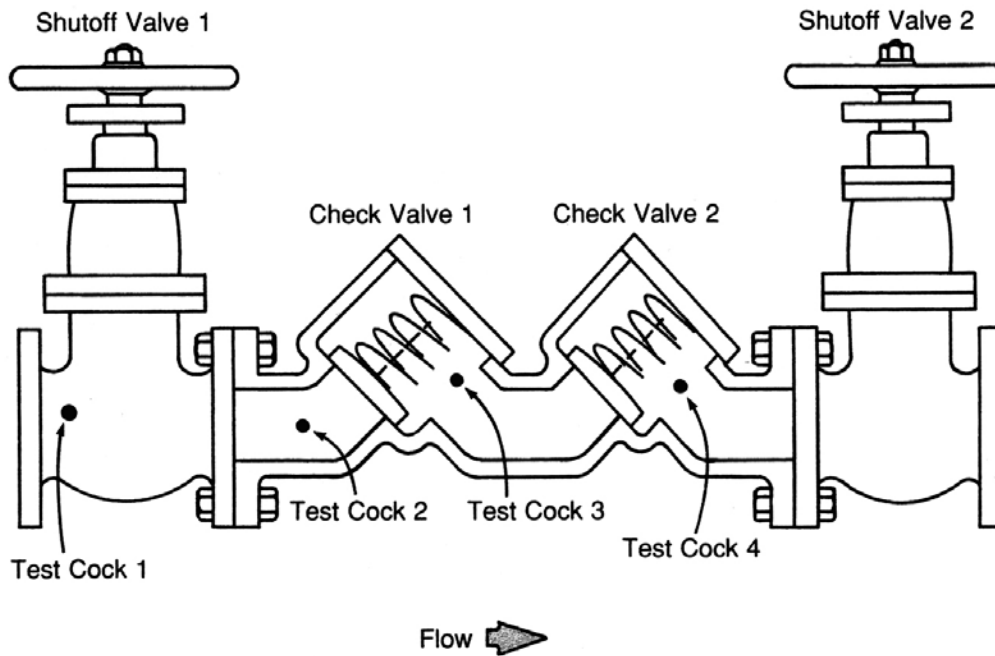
Schematic of Double Check Valve Assembly ⁵
